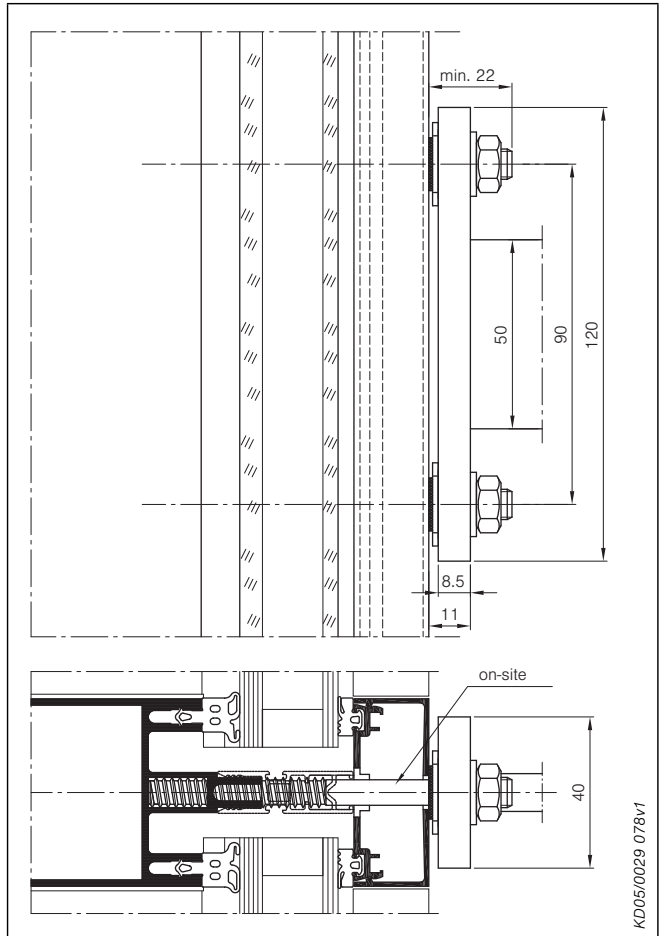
Fixing the guide rail bracket using WICONA WARWIC bolts
